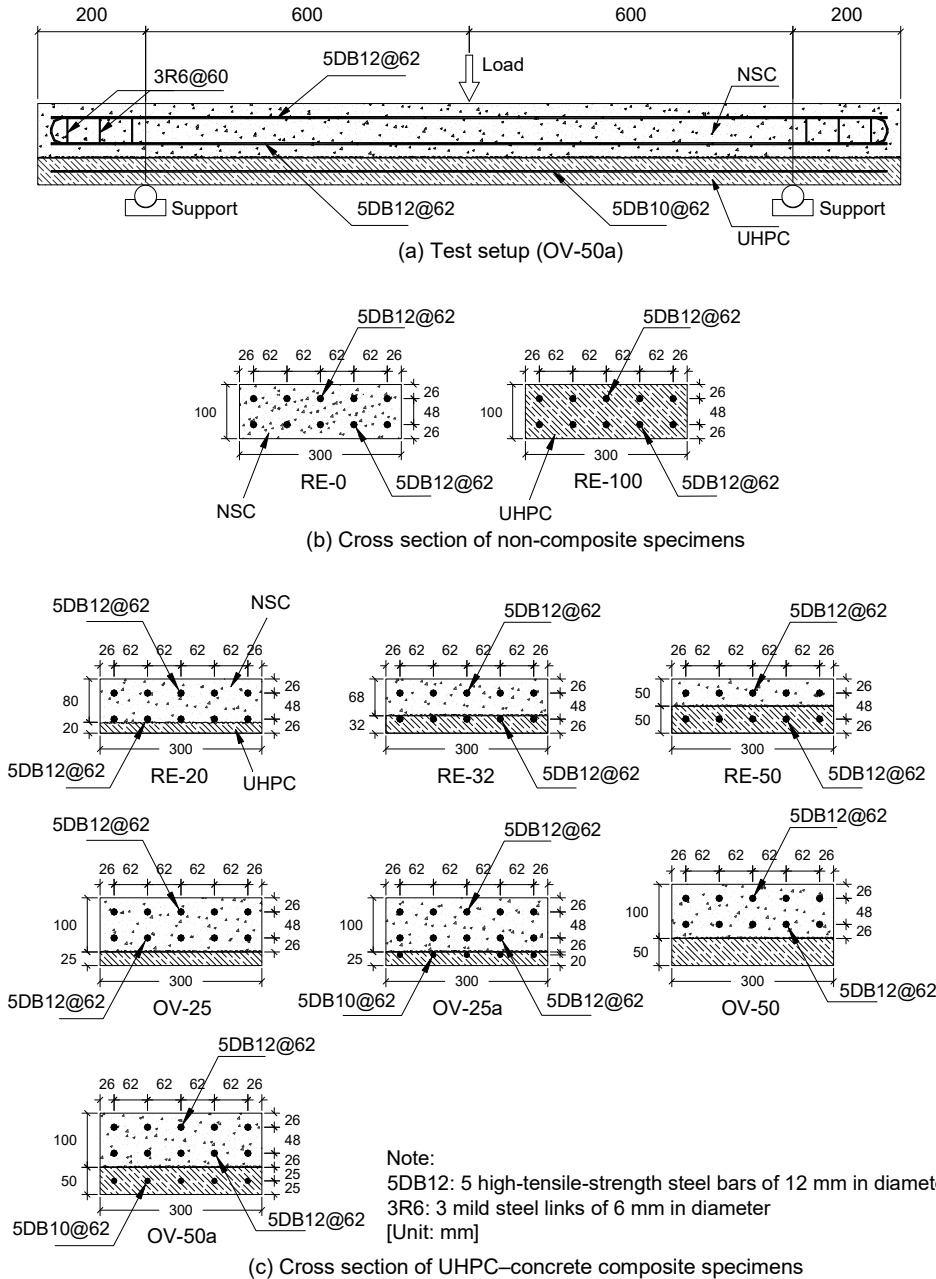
Detailed geometry of UHPC-concrete specimens [8].
